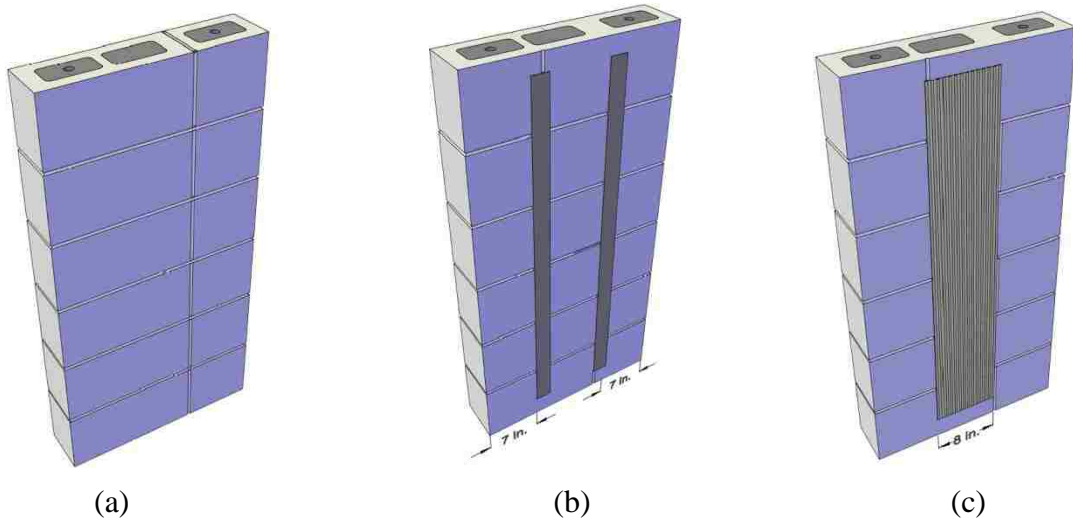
Test specimens: (a) stack pattern, (b) strengthened wall with CFRP (c) strengthened wall with GFRP
